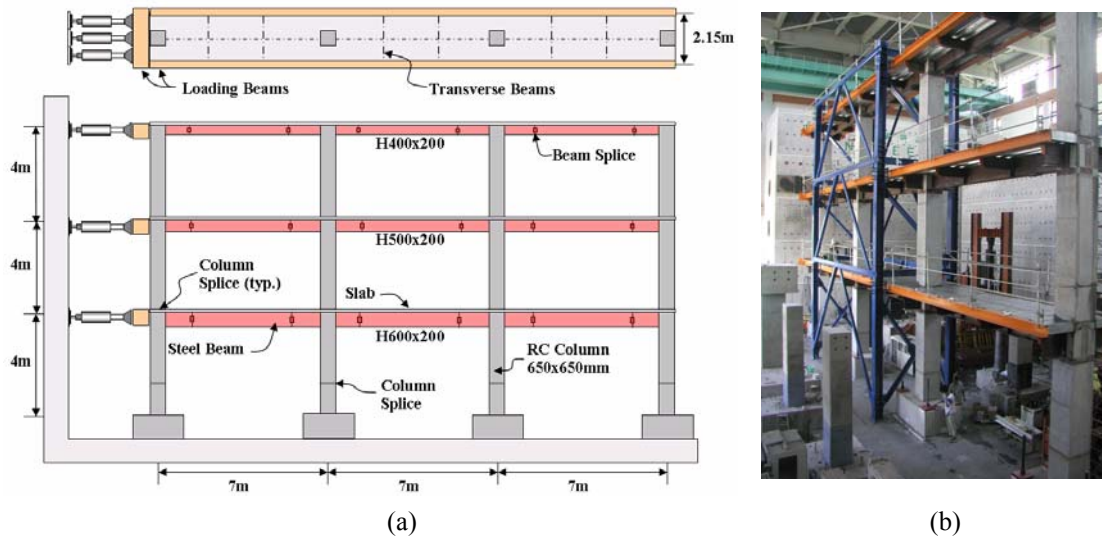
(a) Plan and elevation of the full-scale composite frame specimen.
